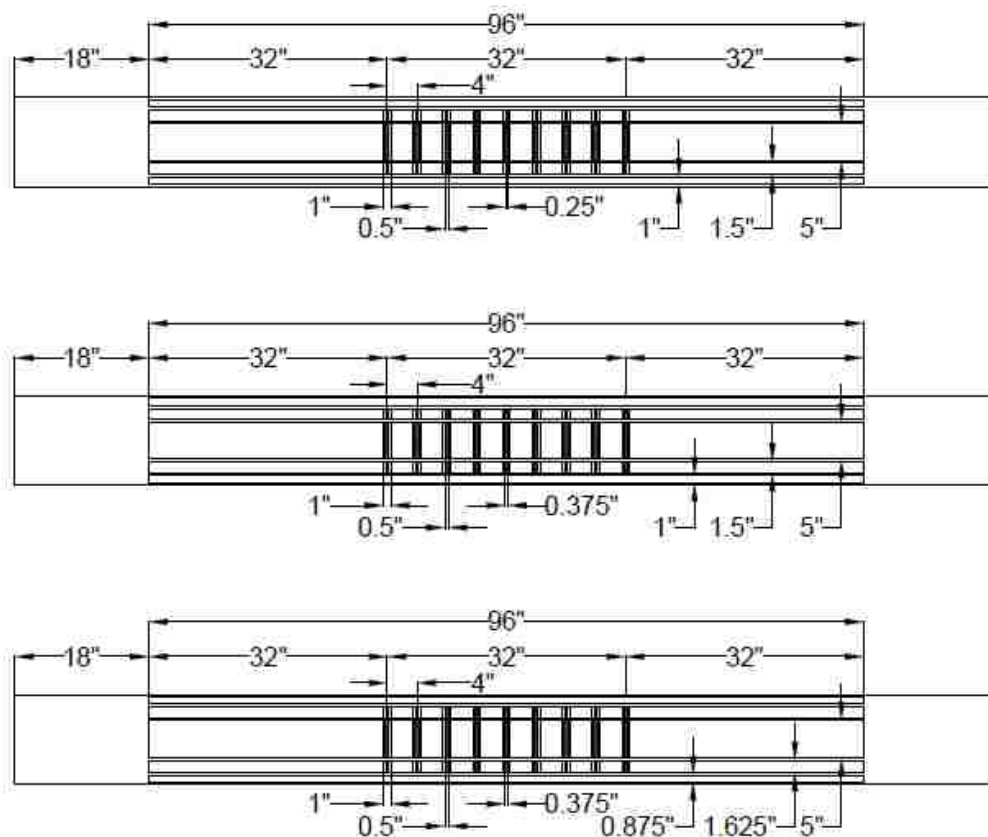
3 Stage FRP Configurations: Beams 8, 9 and Beam 10 and Beams 11, 12
